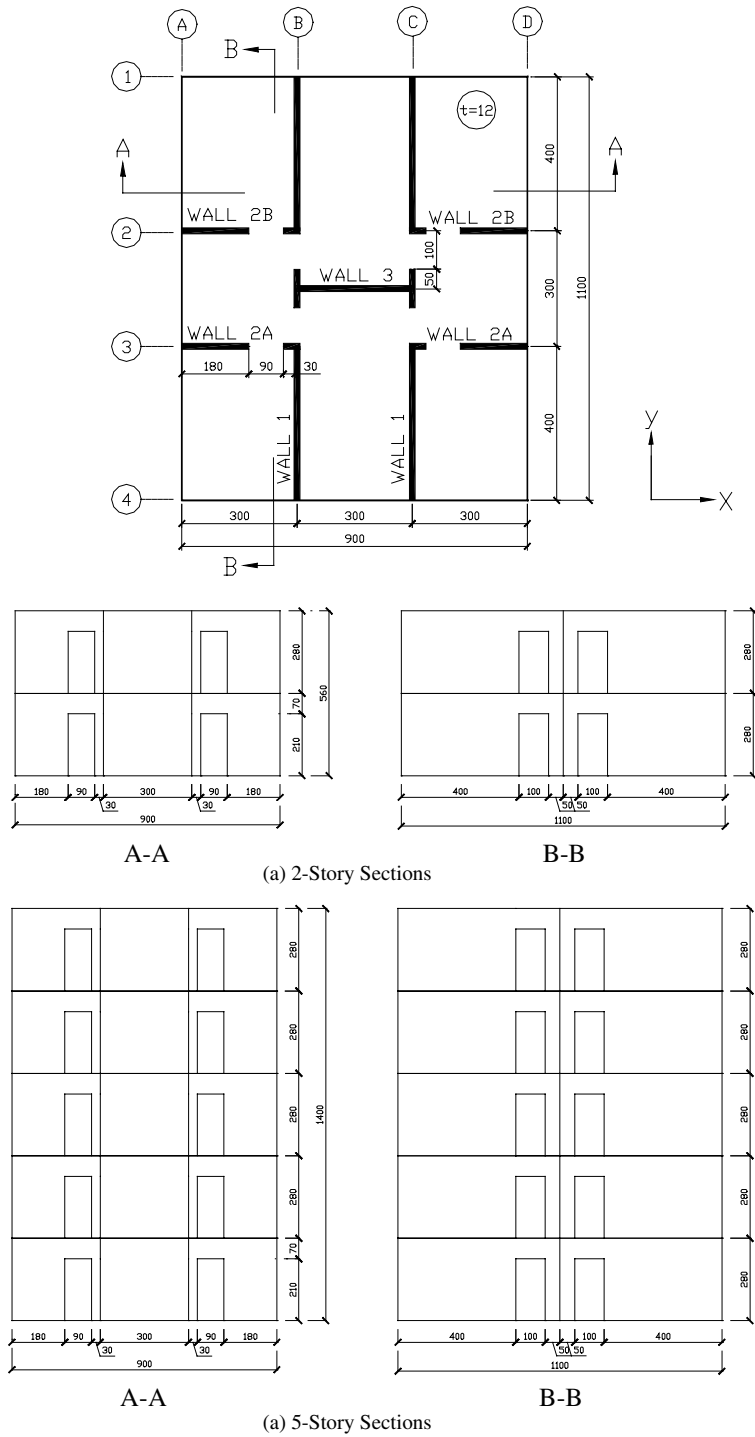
Typical plan and section views for 2- and 5-story buildings (units are in cm).
